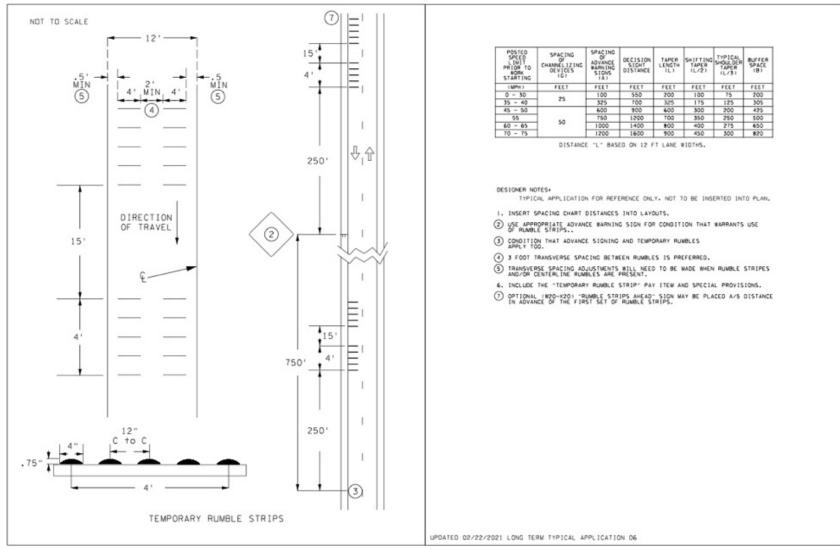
Standard detail for placement of TPRS on multi-lane divided roadway from Massachusetts DOT (2/2)
